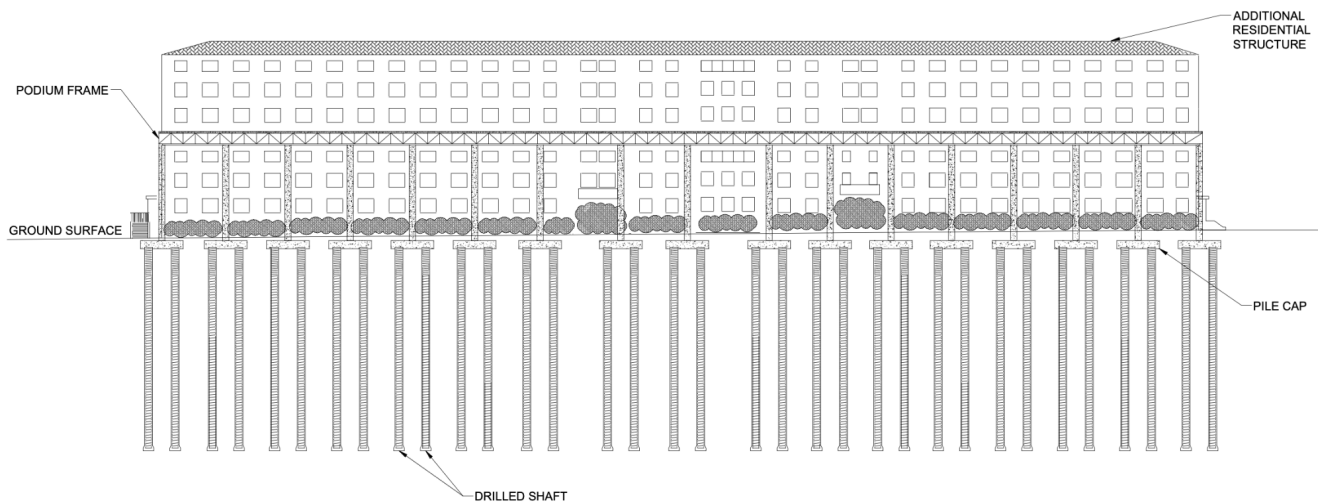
Elevation view of drilled shafts in relation to the ground surface, the podium structure, and the residential expansion.
